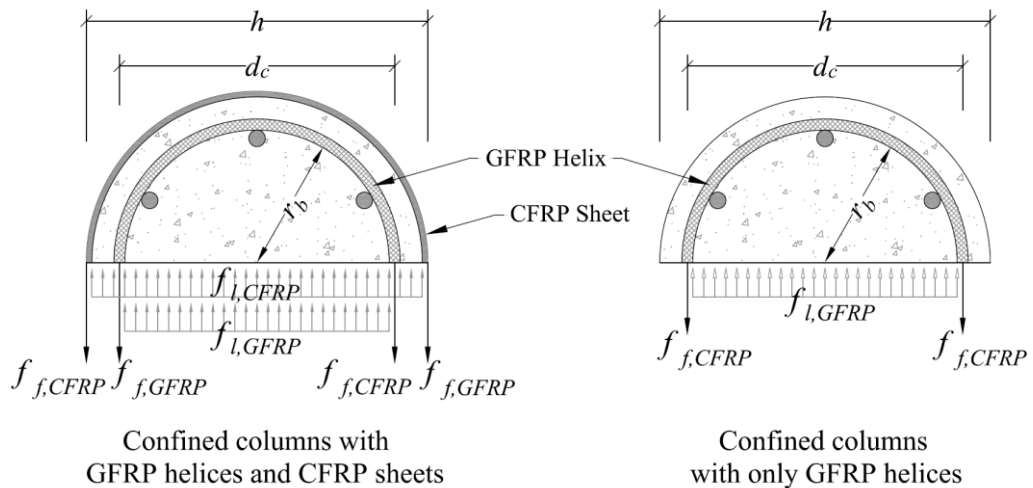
Confining mechanism for concrete confined by GFRP helices and CFRP sheet
